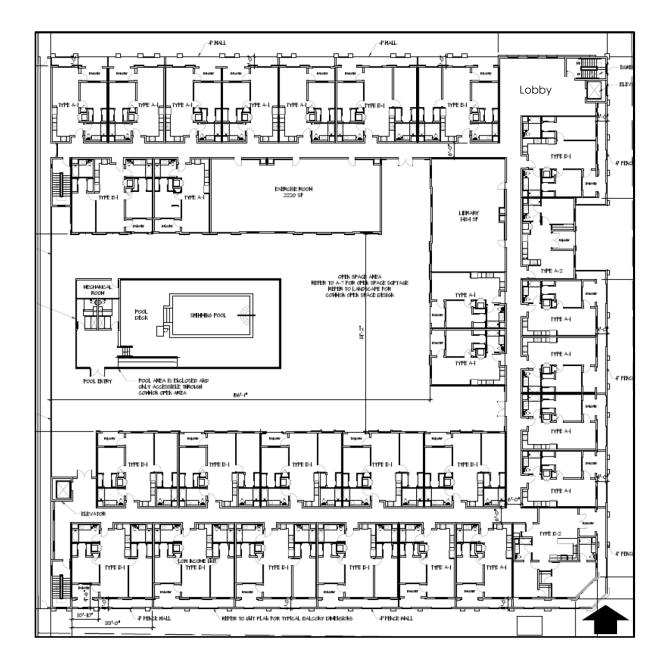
## Exhibit C: LANDSCAPE PLAN- FIRST FLOOR
